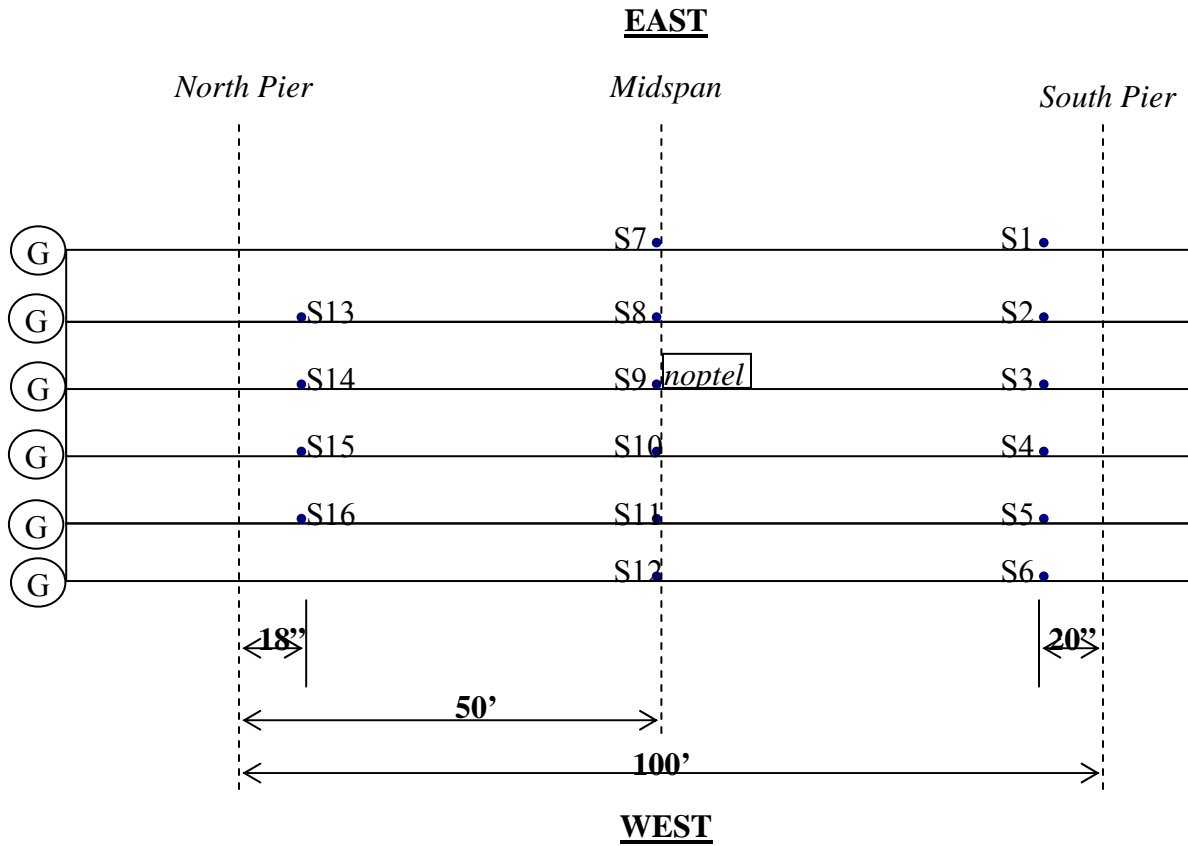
Strain Gage Location in Center Span of Bridge (S09-77023)
